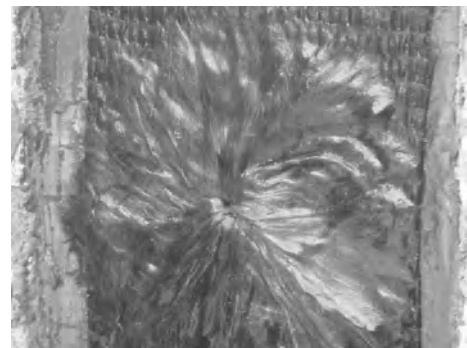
Closeup view of fibre anchor installed over CFRP strip
